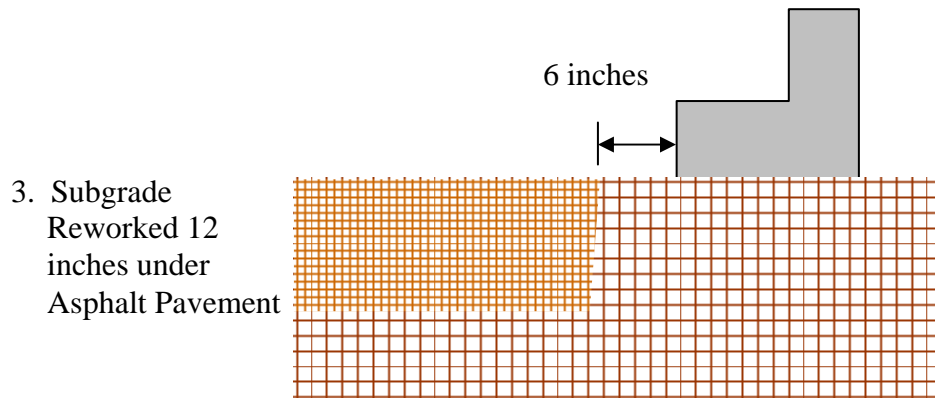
Alternative Full-Depth Hot Mix Asphalt Pavement Subgrade Preparation
